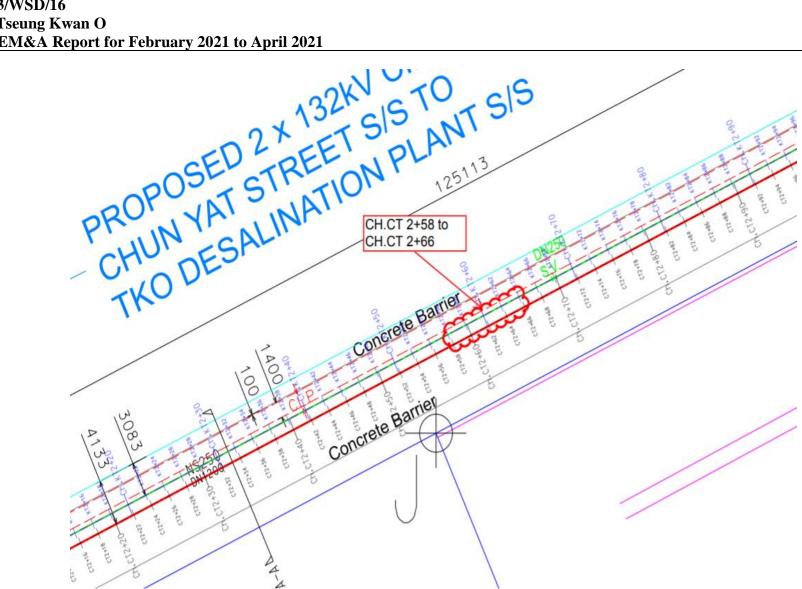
Location Plan for Portion H: CH.CT 2+58 – 2+66
